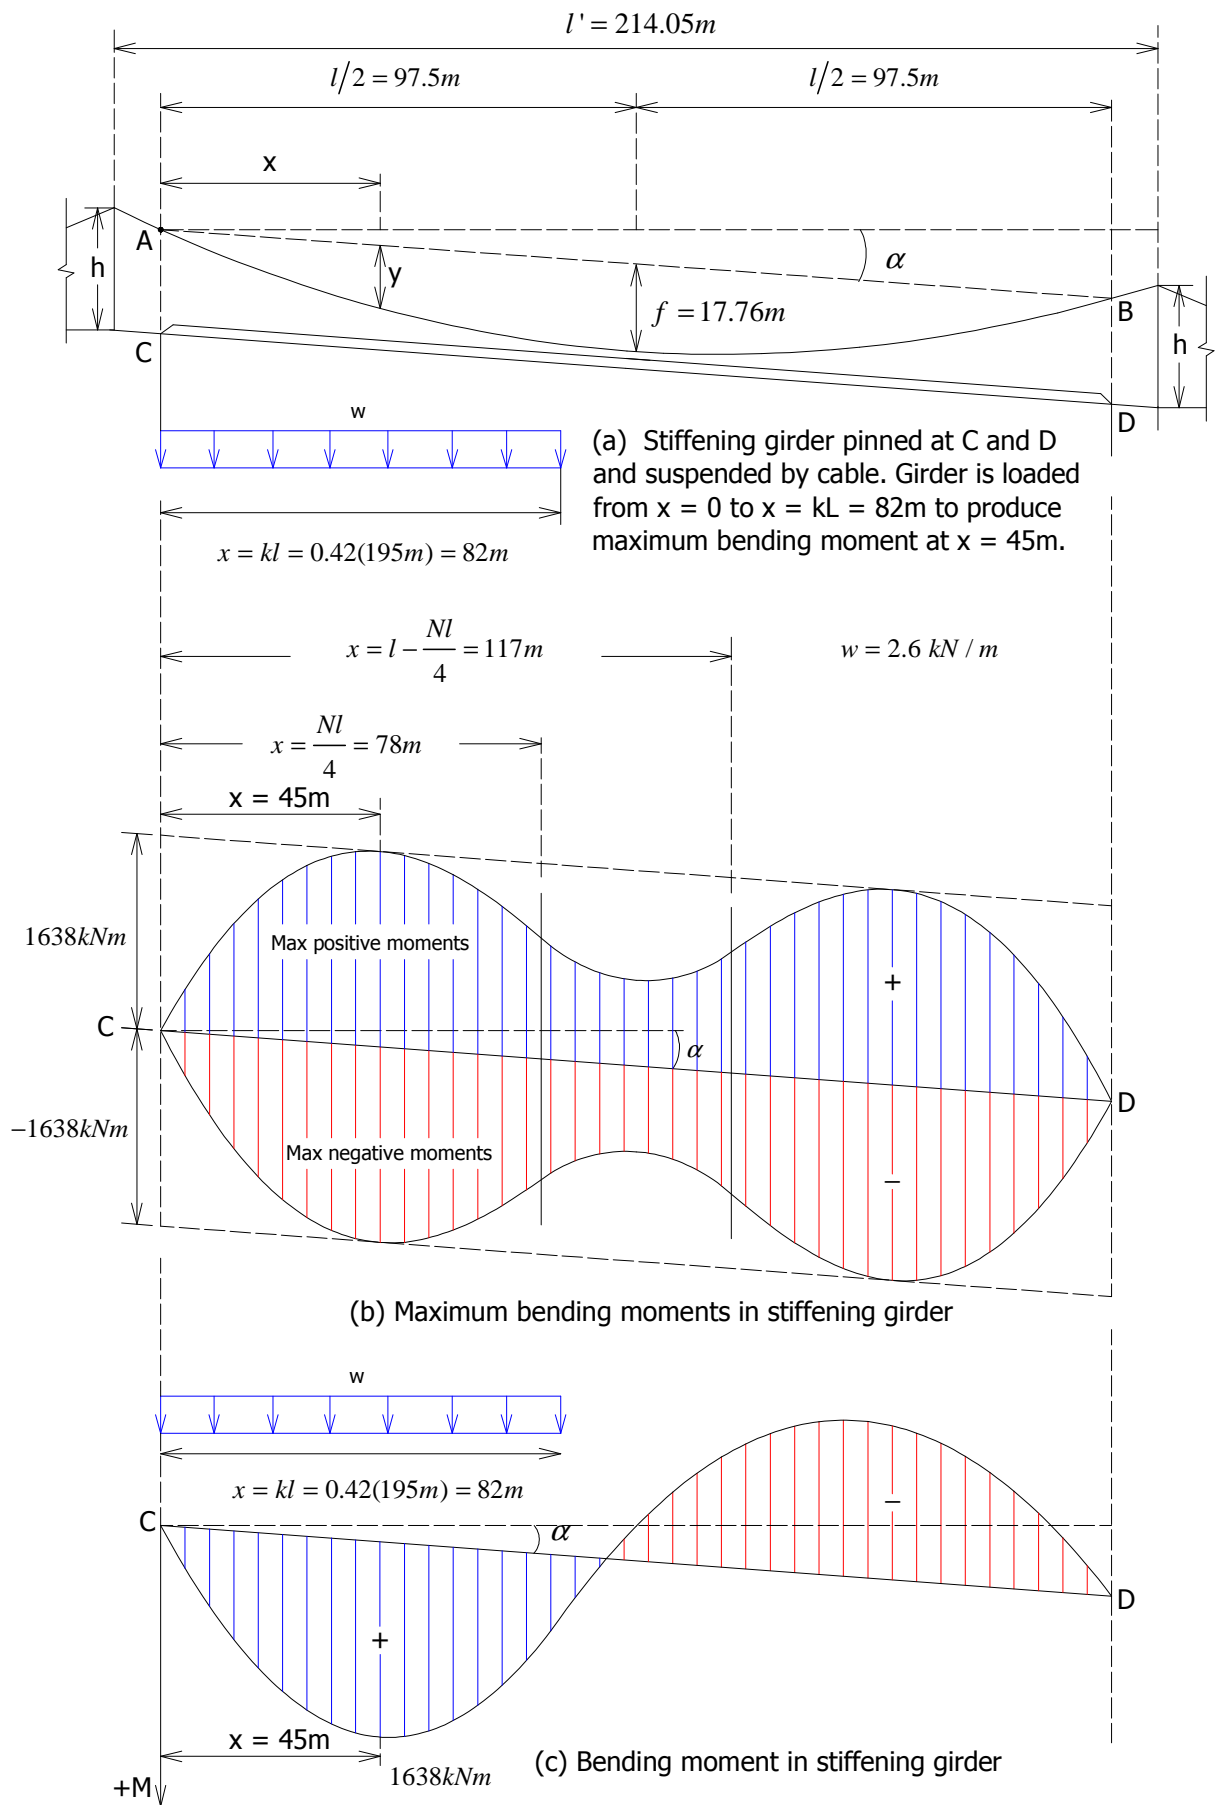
(a) Load arrangement causing maximum bending moment in stiffening girder.
